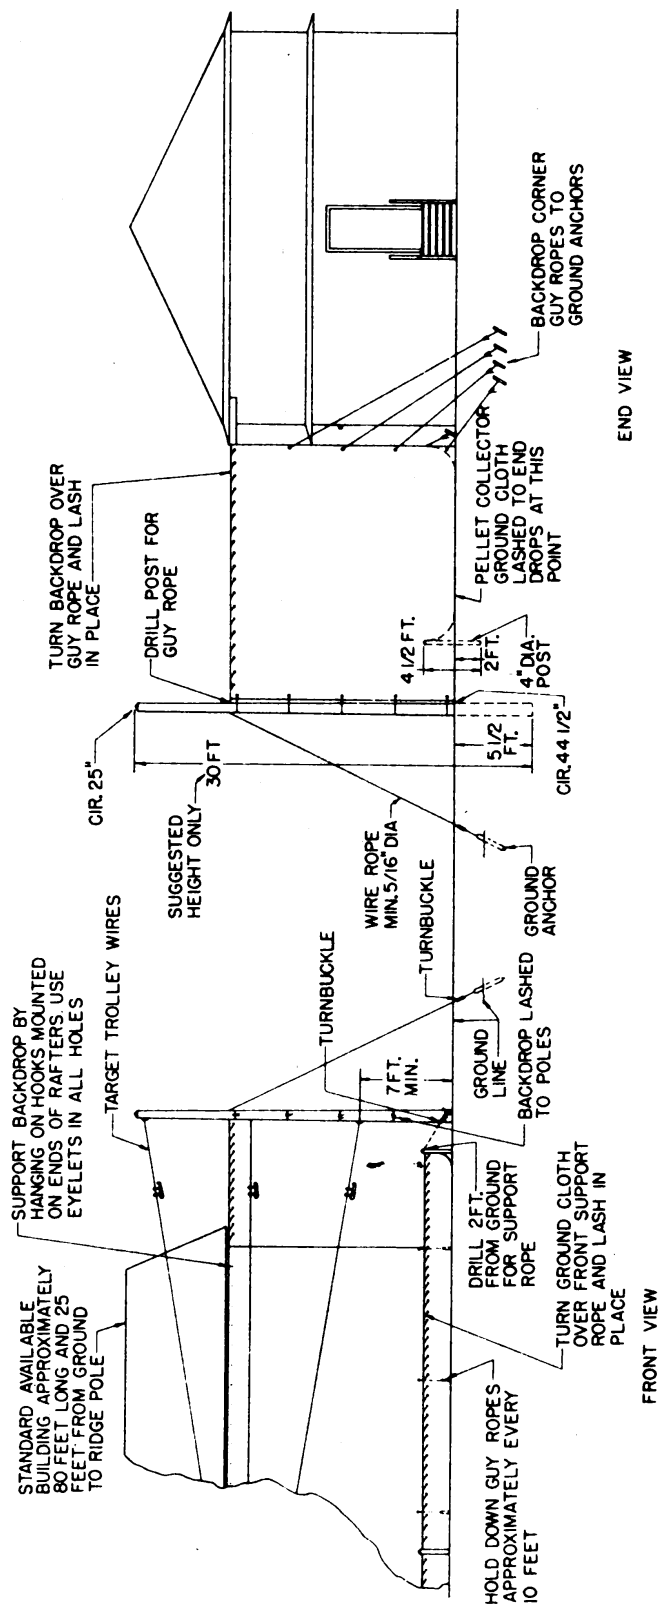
Arrangement of Trainer for Outdoor Operation — Typical Plan View
